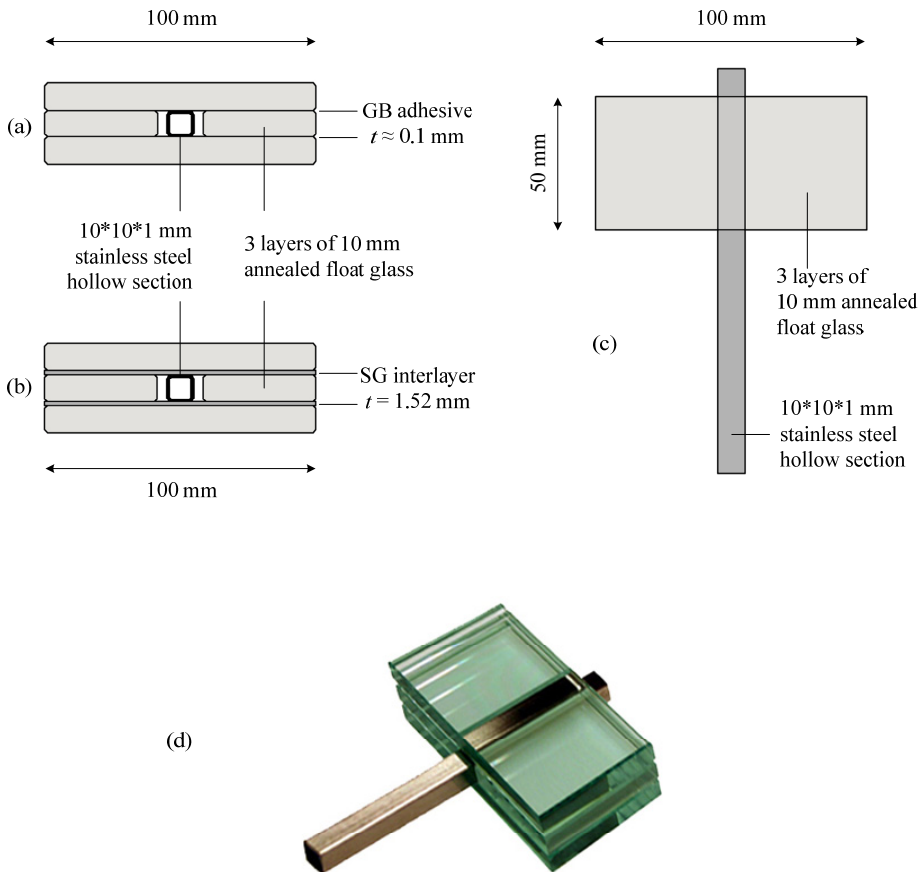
Pull-out specimens; (a) cross-section of the GB-bonded pull-out specimens; (b) cross-section of the SG-laminated specimens; (c) front view pull-out specimens; (d) photograph of assembled specimen.
